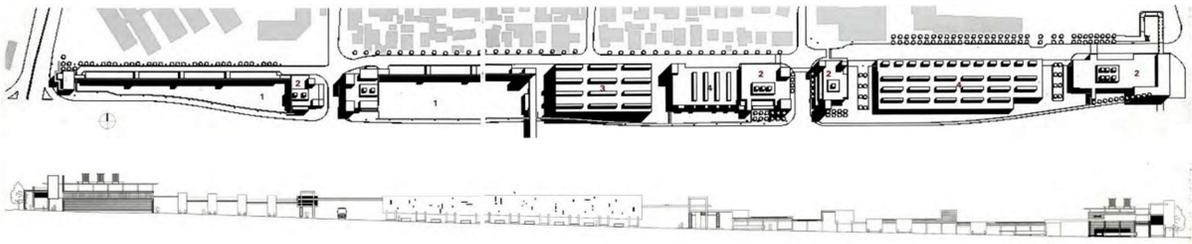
Site plan and elevation of the Baragwanath Transport Interchange.
